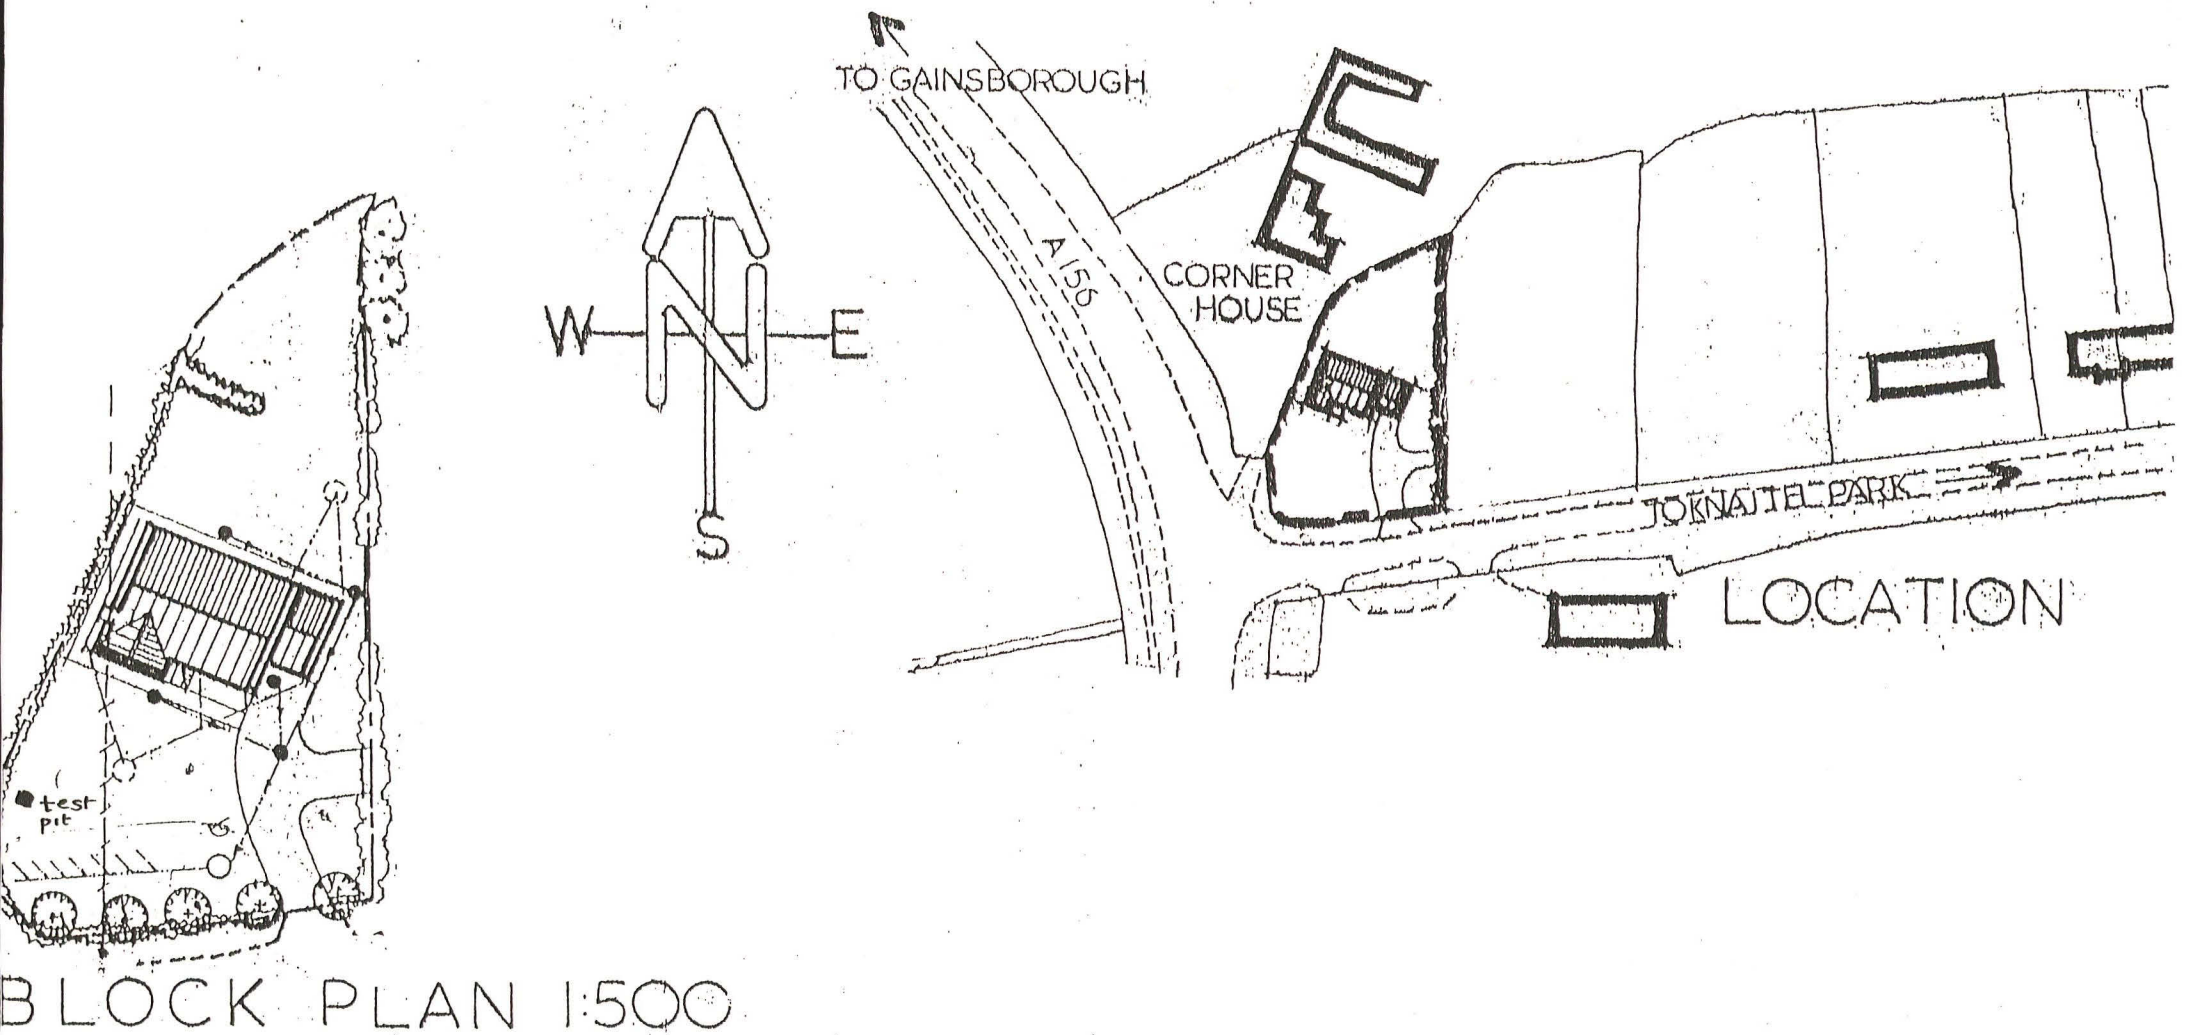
House plot location and trench plan (reproduced from plans by architect)
